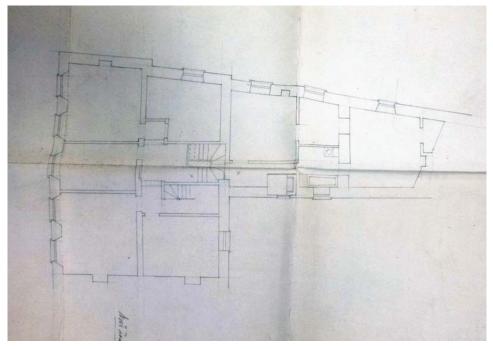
First floor plan, undated but probably c1901 (CAC(B) Z/1028/2 1901-1904)
